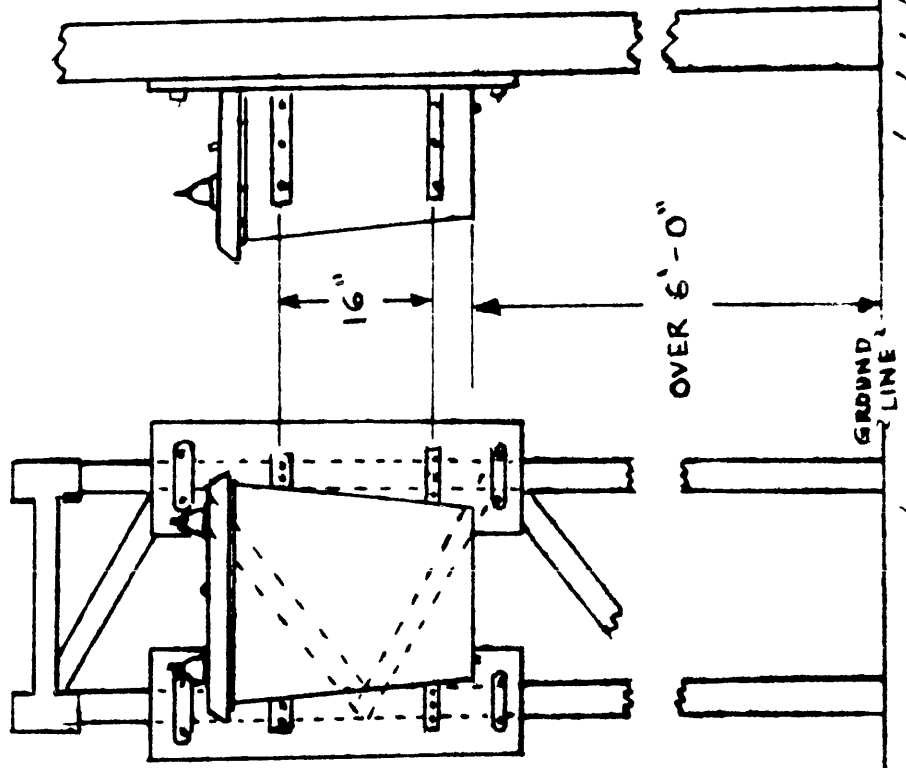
TER-3500, Typical Pole and Tower Mounting
